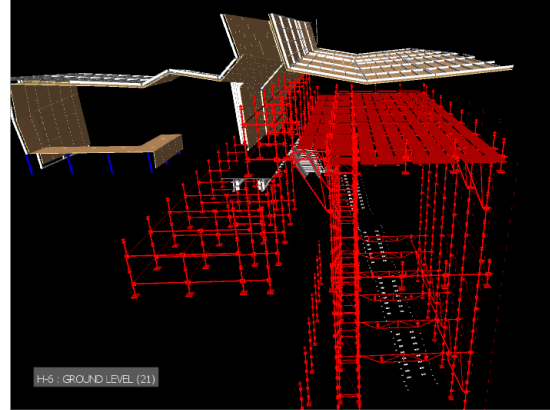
Start of scaffolding demolition. Screen wall west of skylight being turned into table space
